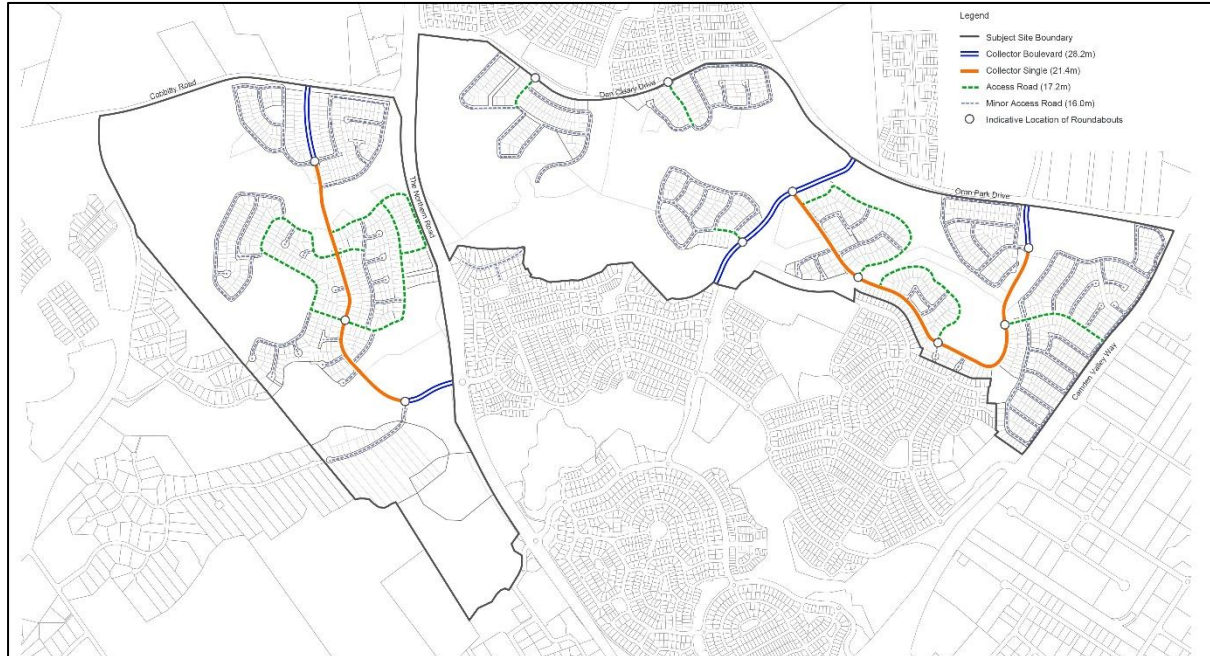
Harrington Grove Indicative Road Hierarchy Plan
